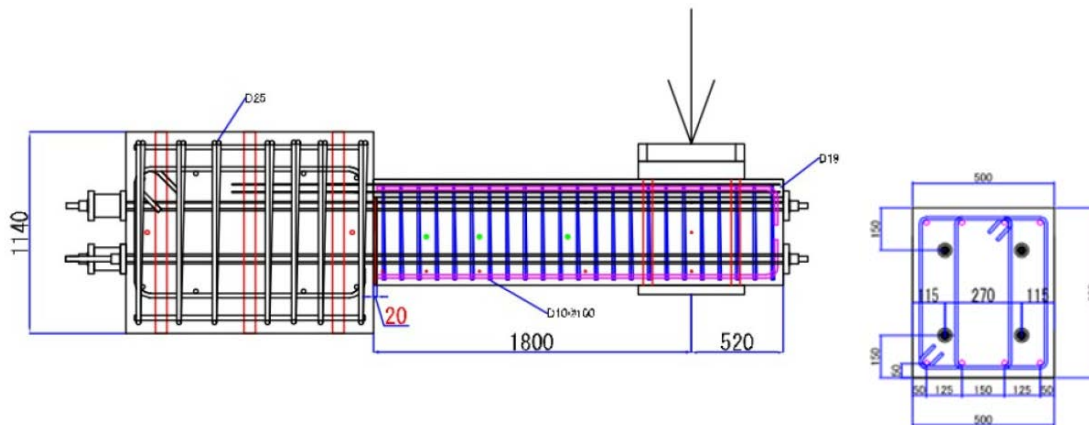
Example of beam-column Jointed Connection (member PCa 13 reported in [3])
